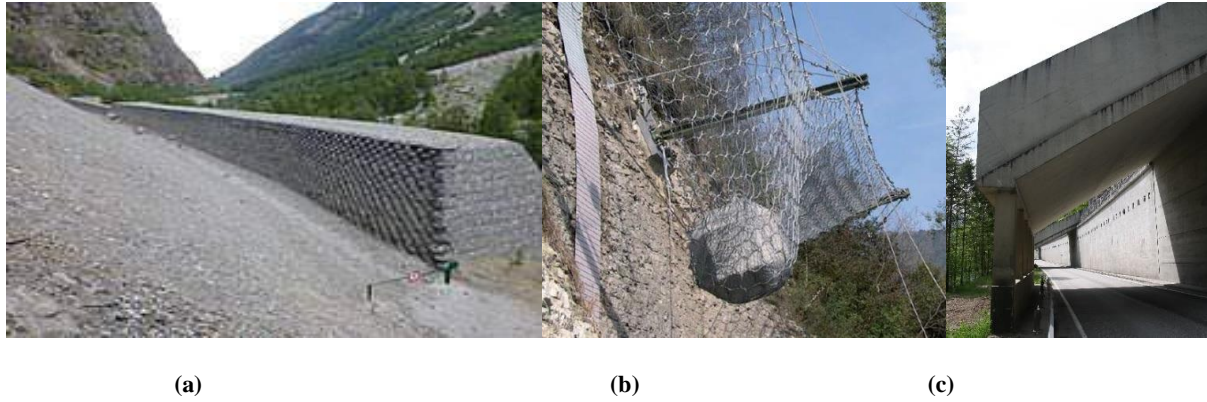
Rockfall avoidance structures; (a) embankments; (b) fences; (c) roof galleries.
